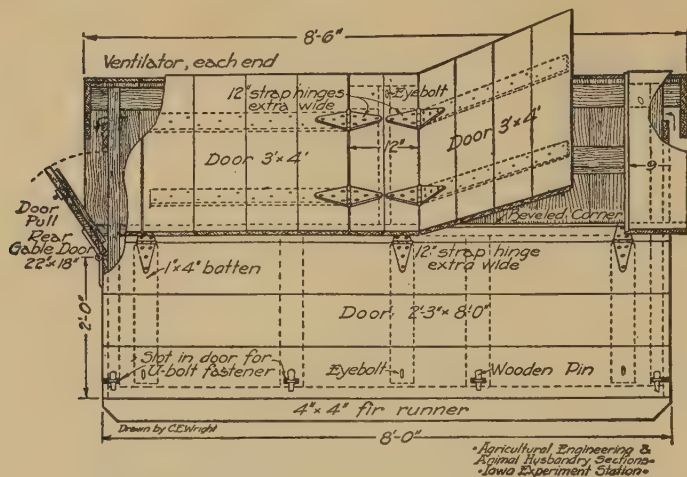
SIDE VIEW OF IOWA GABLE-ROOF HOUSE
